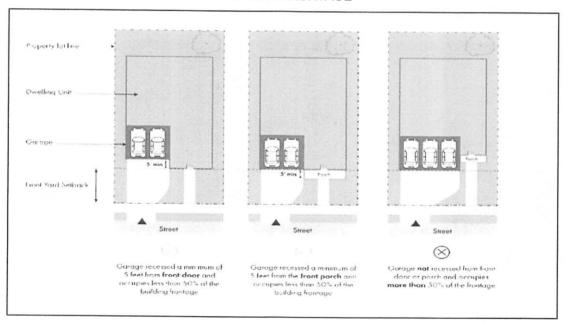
FIGURE: IF A GARAGE DOOR FACES THE STREET, THE FRONT PLANE OF THE GARAGE SHALL BE SETBACK FROM THE FRONT PORCH OR PATIO AND OCCUPY NO MORE THAN 50% OF THE BUILDING FRONTAGE
